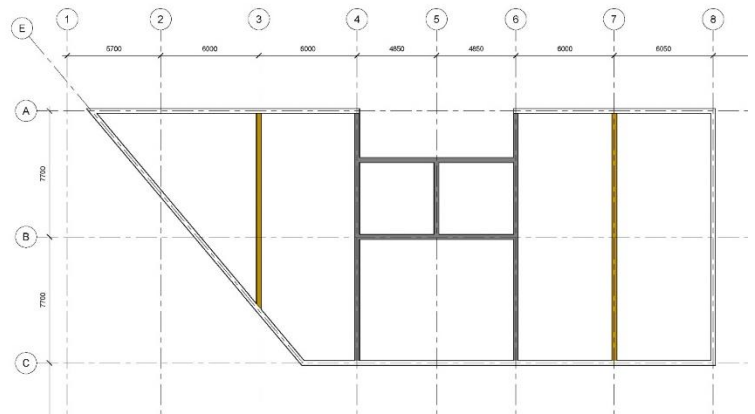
Typical floorplan. Adapted from “Haut - A 21-storey Tall Timber Residential Building”, by R. Verhaegh et al., 2020, *International Journal of High-Rise Buildings*, 9(3), p. 216.
